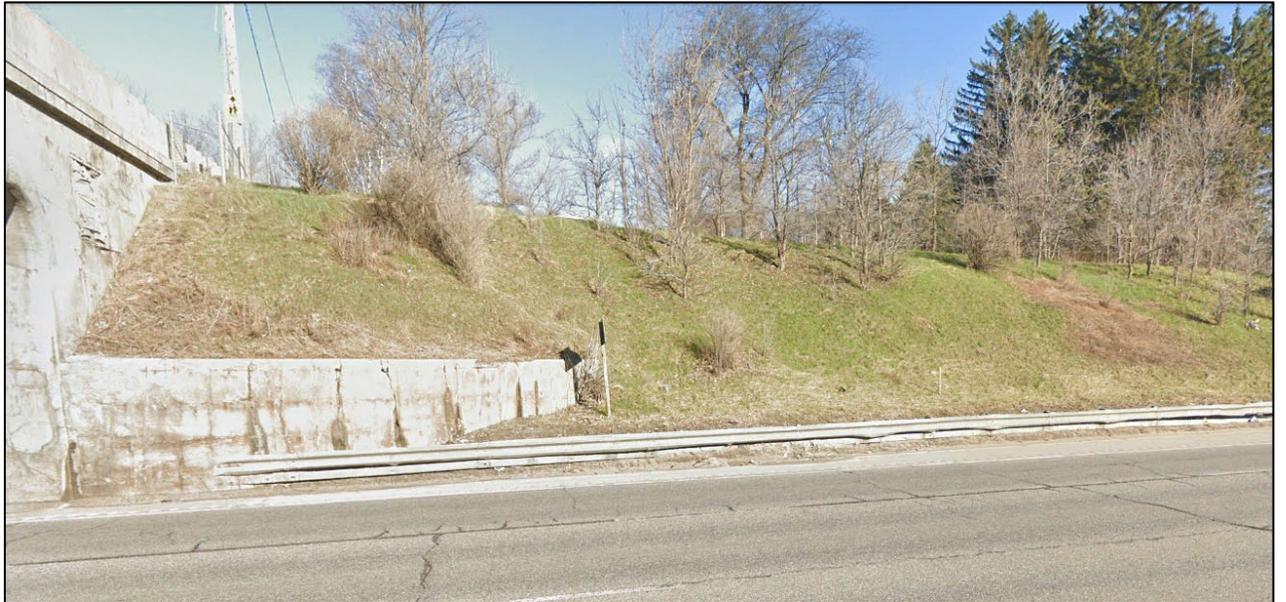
Northwest side of Highway 400 and Sunnidale Road Underpass
